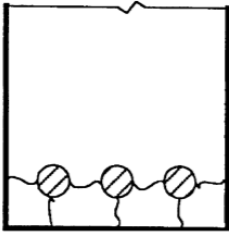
Cross-sectional view of a splitting failure (ACI 408R-03)
